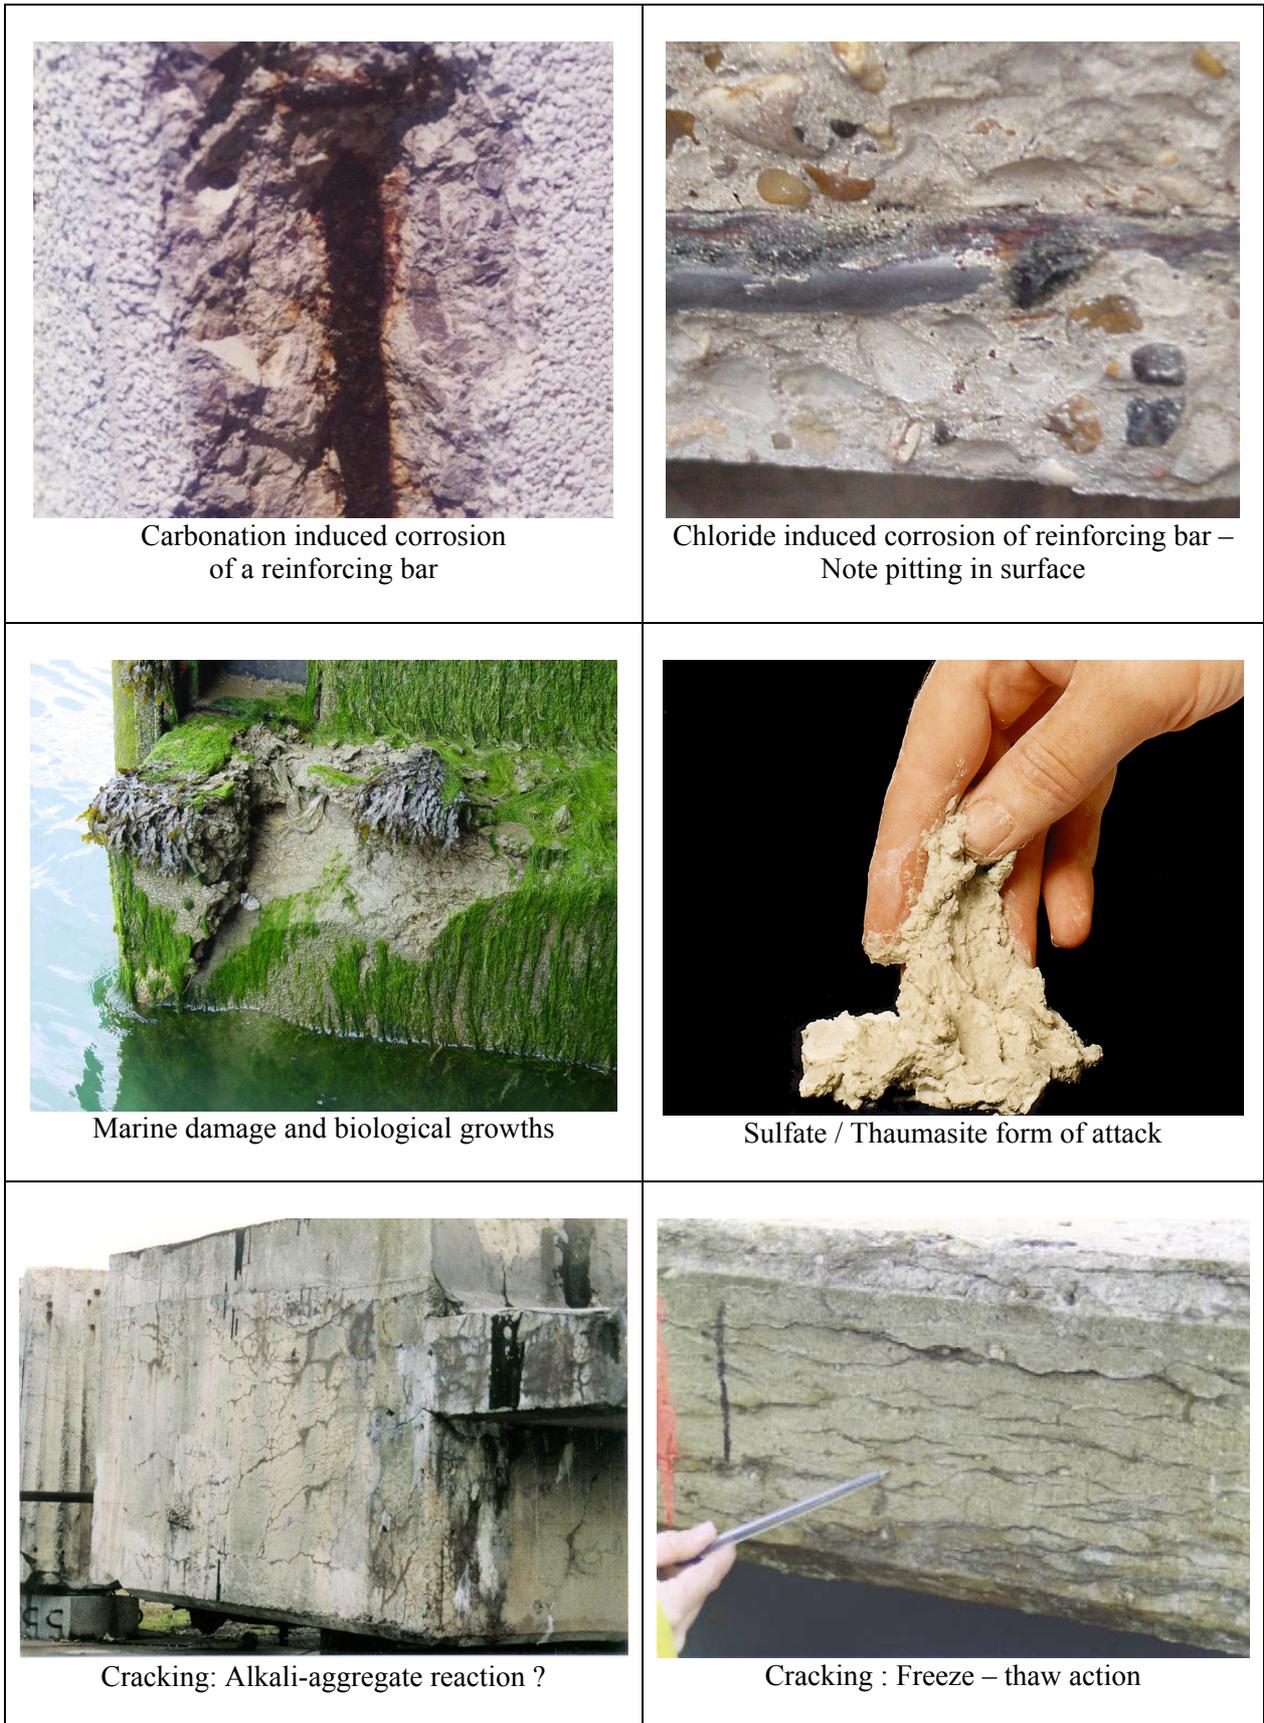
A: Examples of some forms of deterioration affecting concrete structures
